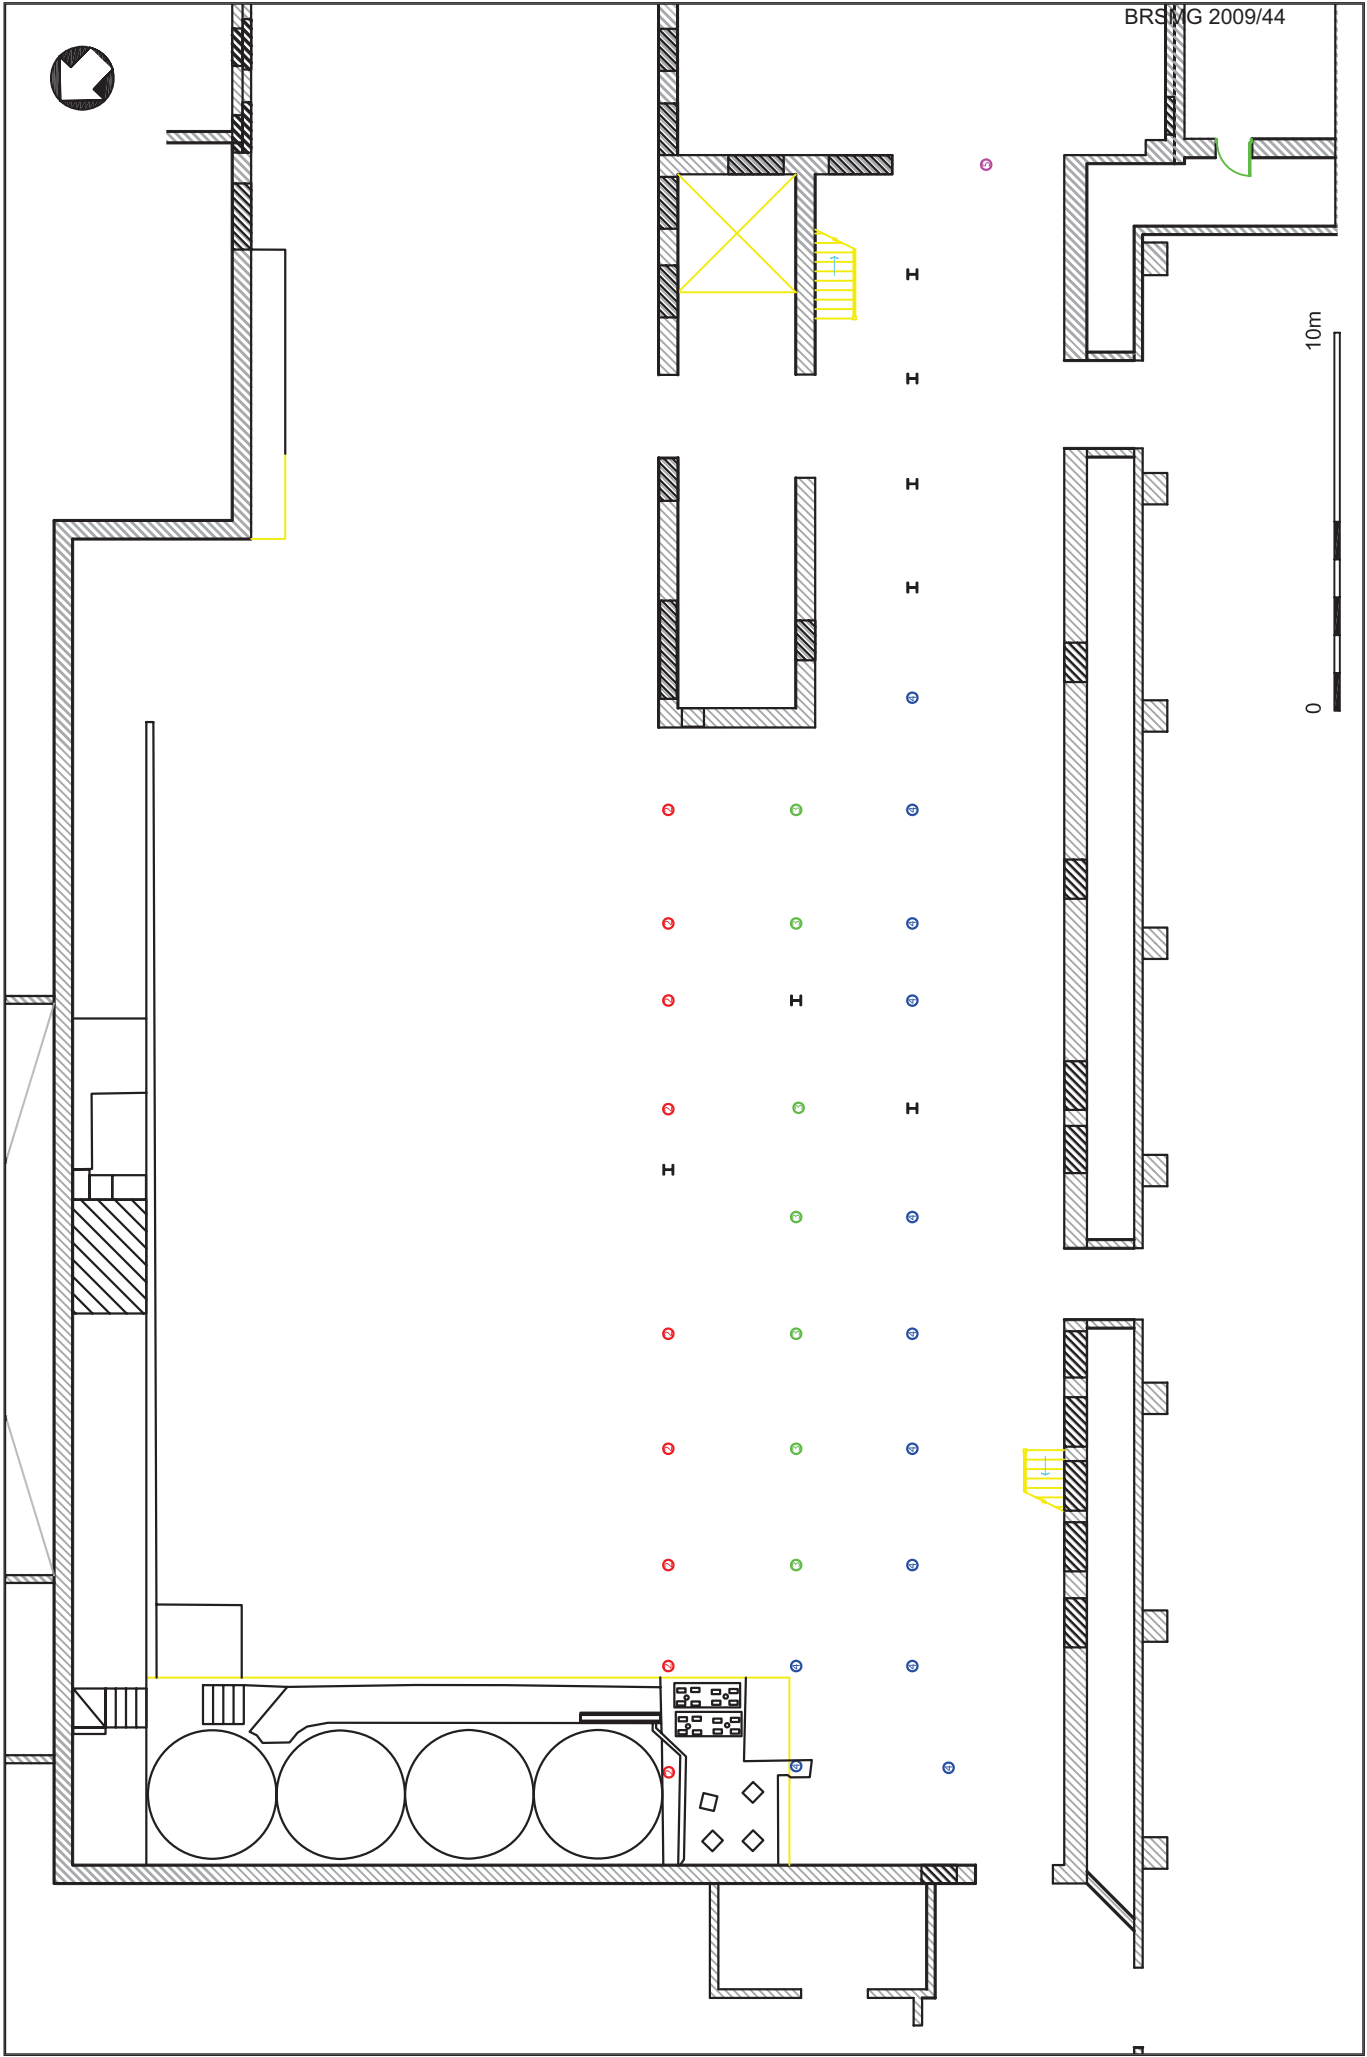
Plan of columns within the phase 1 building (Type 2 red, Type 3 green, Type 4 blue, Type 5 magenta), 1:200
